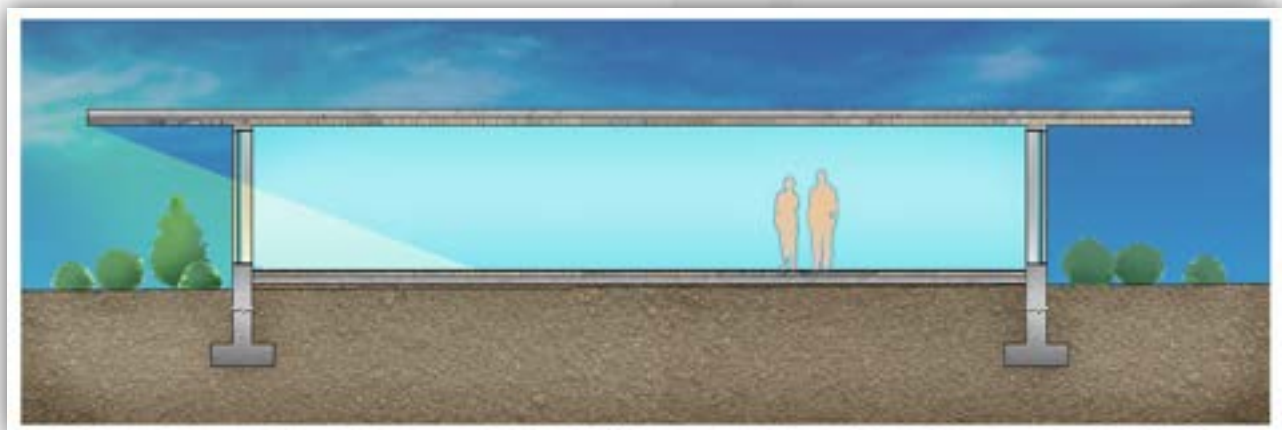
section view at 3:00 PM (15:00) during an Equinox (March or September) with slab-to-slab windows and nine foot roof overhang. Even the hyper-extended overhang does not block out the majority of the sunlight at a peak sunlight period. This is due to how low the sun lays on the horizon at 21° elevation. Source: primary.
